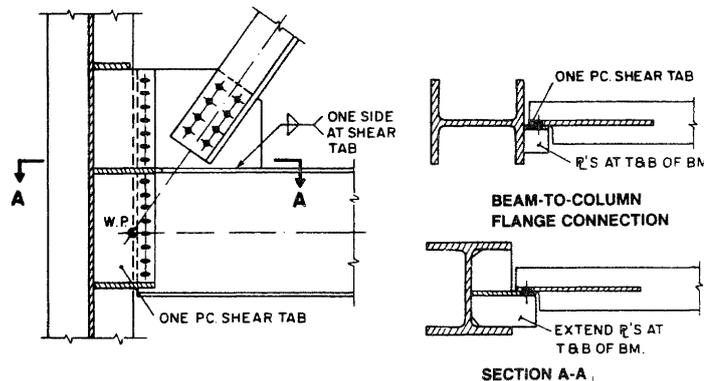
TYPICAL DETAIL FOR BRACE AT NON-MOMENT BEAM-COLUMN CONNECTION
